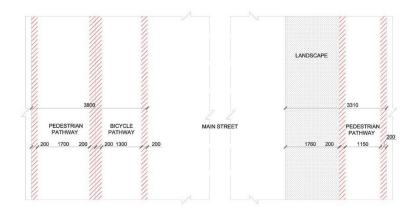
Street width and buffer spaces (in mm) for Gateway 3 in the area surrounding Offenbach am Main Hauptbahnhof
